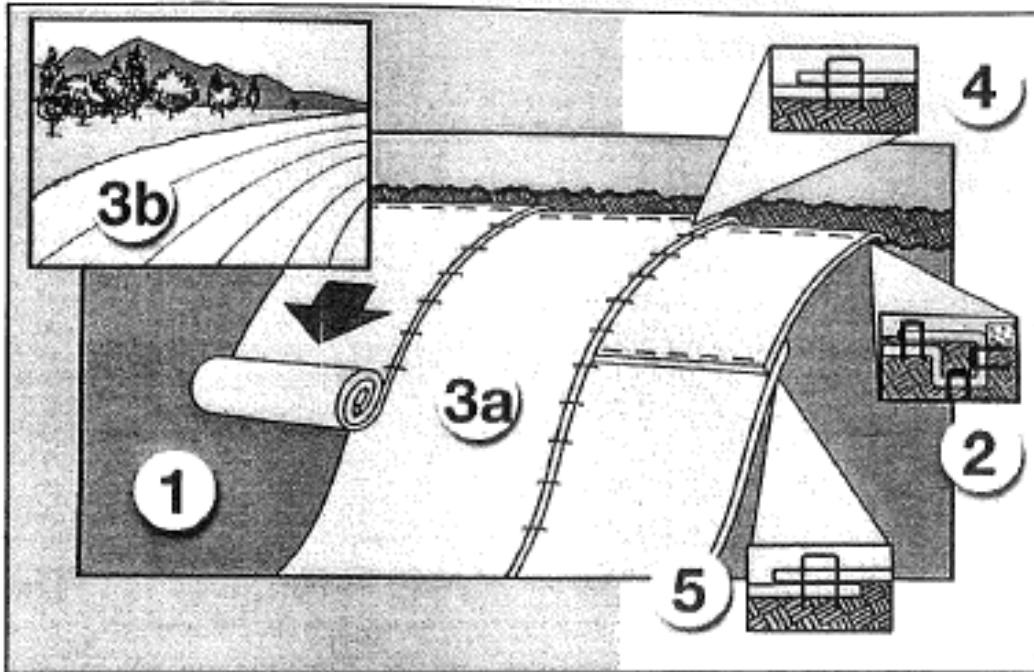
Erosion control mat slope installation example (North American Green, 2002).
